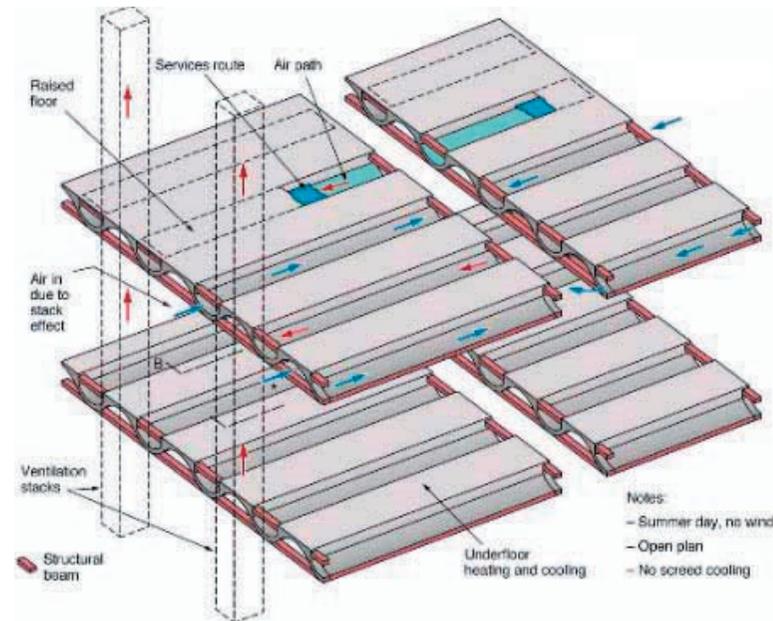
Structural system showing its adaption as a ventilator and provider of thermal energy
